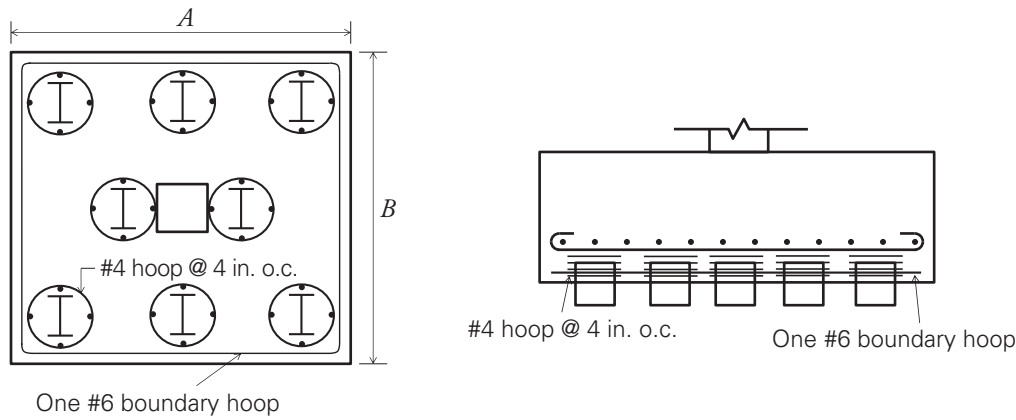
Additional prescriptive steel requirement when high load piles are used.
